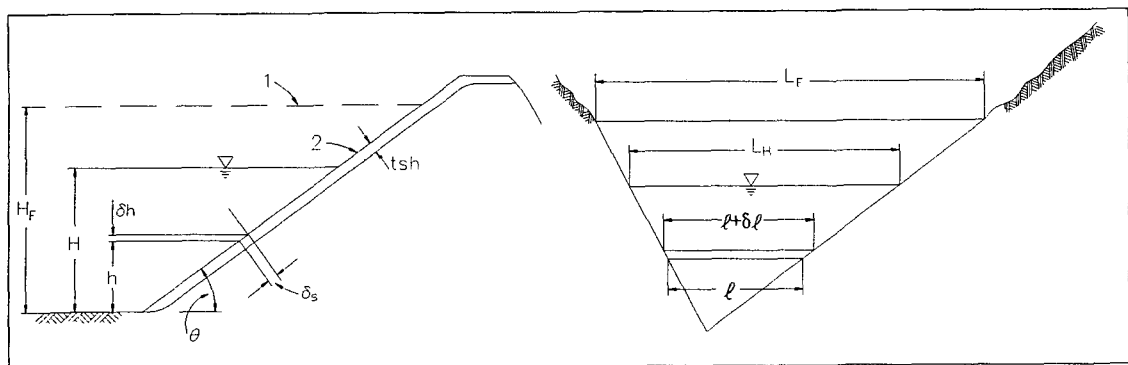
Derivation of apparent permeability relationship (a) Cross section (b) Elevation of Dam
